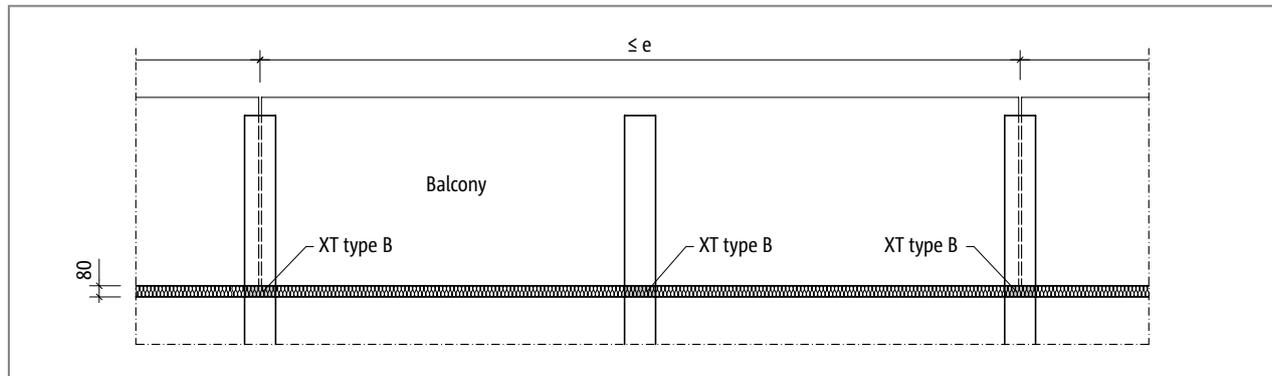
Schöck Isokorb® XT type B: Expansion joint arrangement
